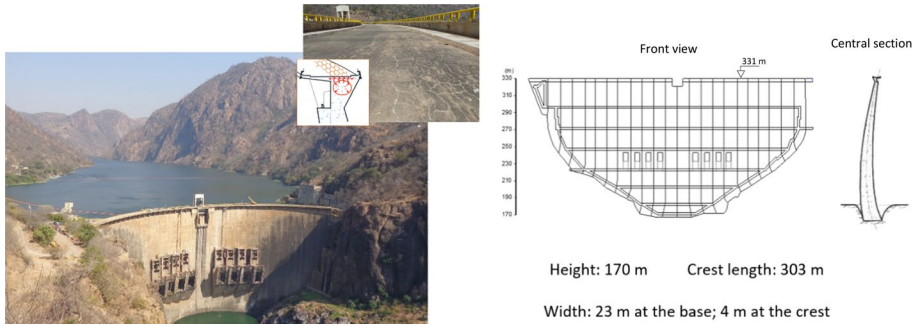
Cahora Bassa dam. Downstream view, crest cracking view, and technical drawings
